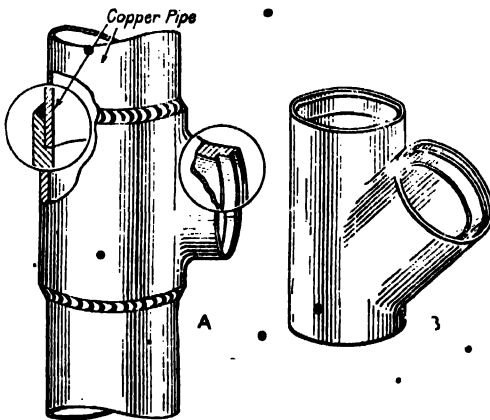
Copper fittings for branch joints, with shoulders for plain ends of tubes. (A) Square T for water service : circles enclose enlarged sections—left, of joint ; right, of socket ready for joint. (B) Oblique T. Three welds are required as compared with one for Fig. 14.
